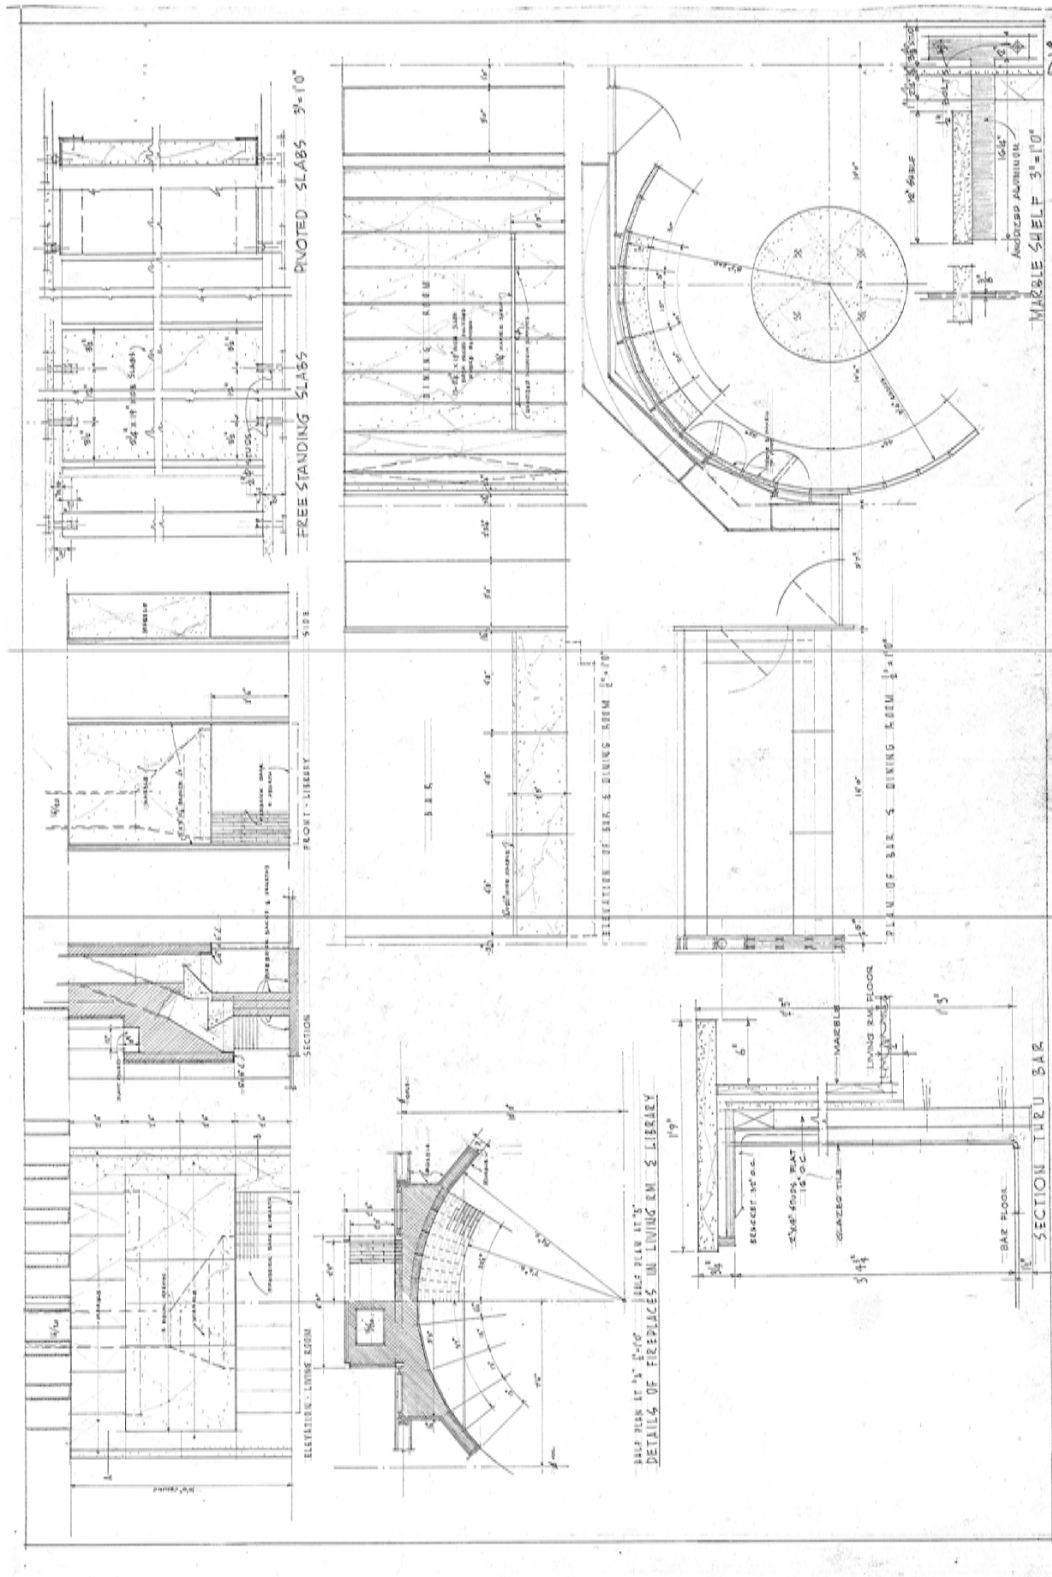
of 10:	Dining area and living room fireplace, circular interior walls plans & details
